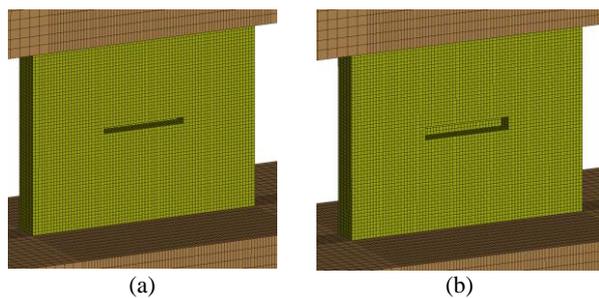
Concrete voids in shear wall with thickness of (a) 4 cm, (b) 8 cm.
